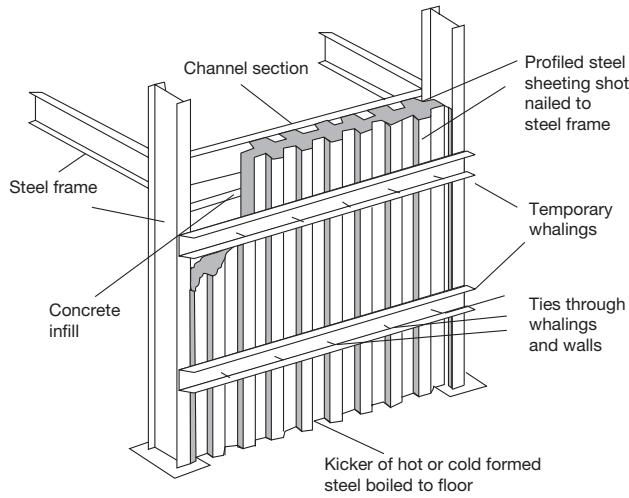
Application of DPSC wall panels in buildings (Wright and Gallocher 1995)
